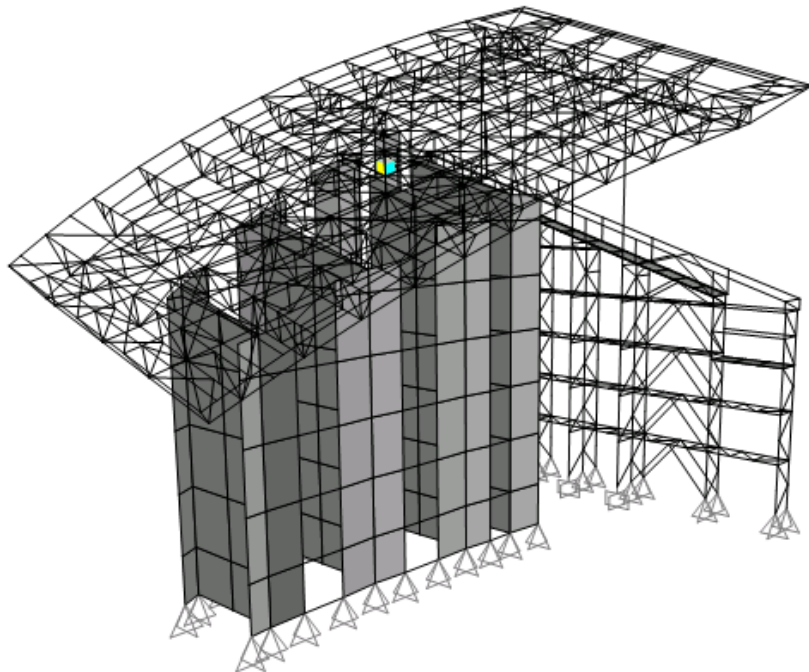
ROOF TRUSS 3D SAP200 MODEL
